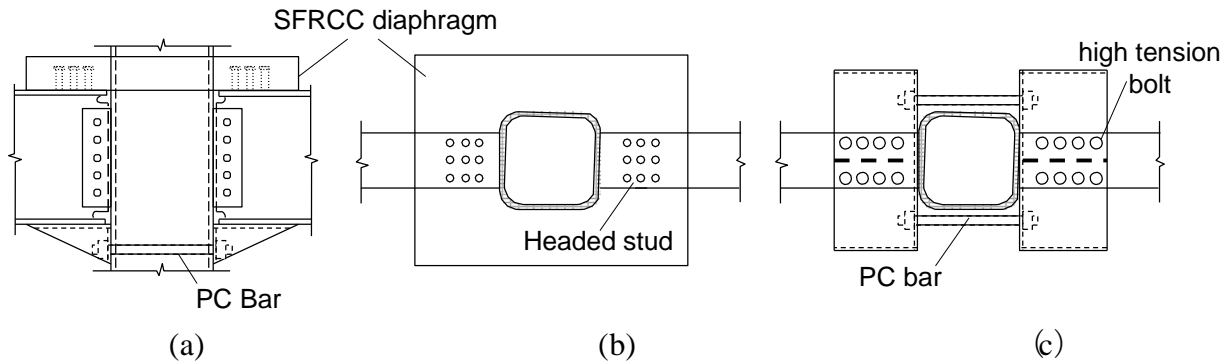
Proposed beam-to-column connection with floor slab functioning as exterior diaphragm: (a) Elevation, (b) Plan of top flange, (c) Plan of bottom flange
